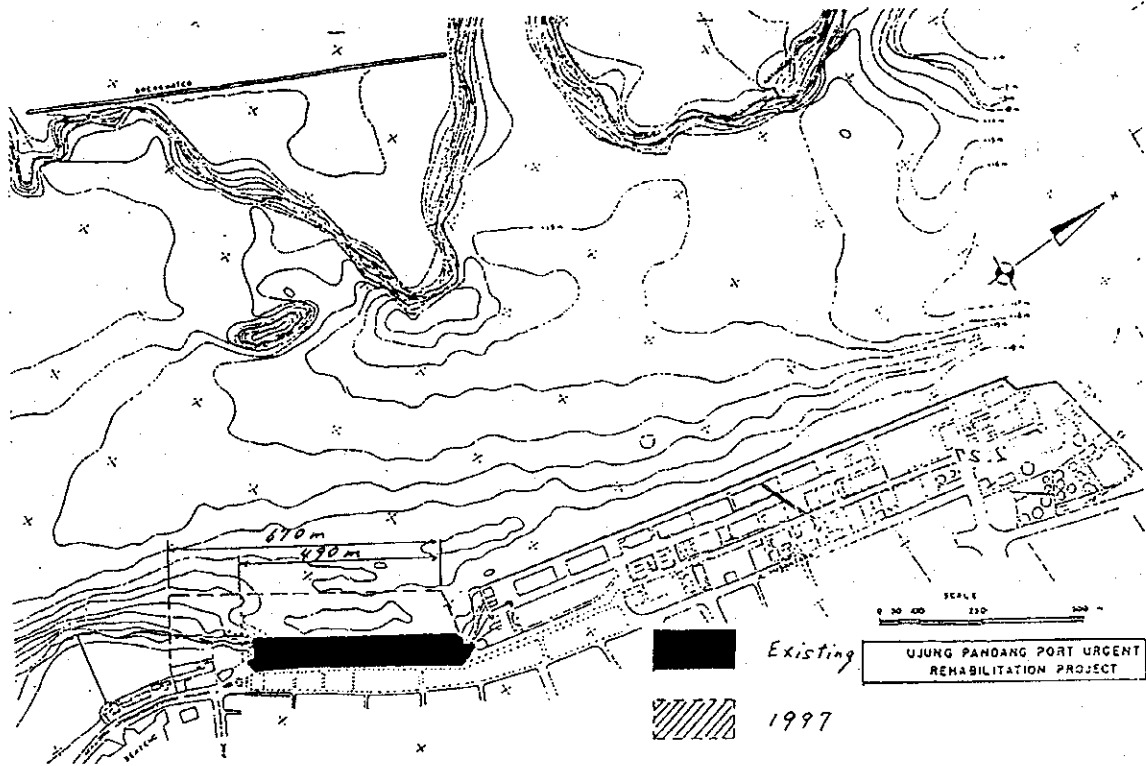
Existing Container Terminal Development Plan (7): Ujung Pandang (South Sulawesi)
